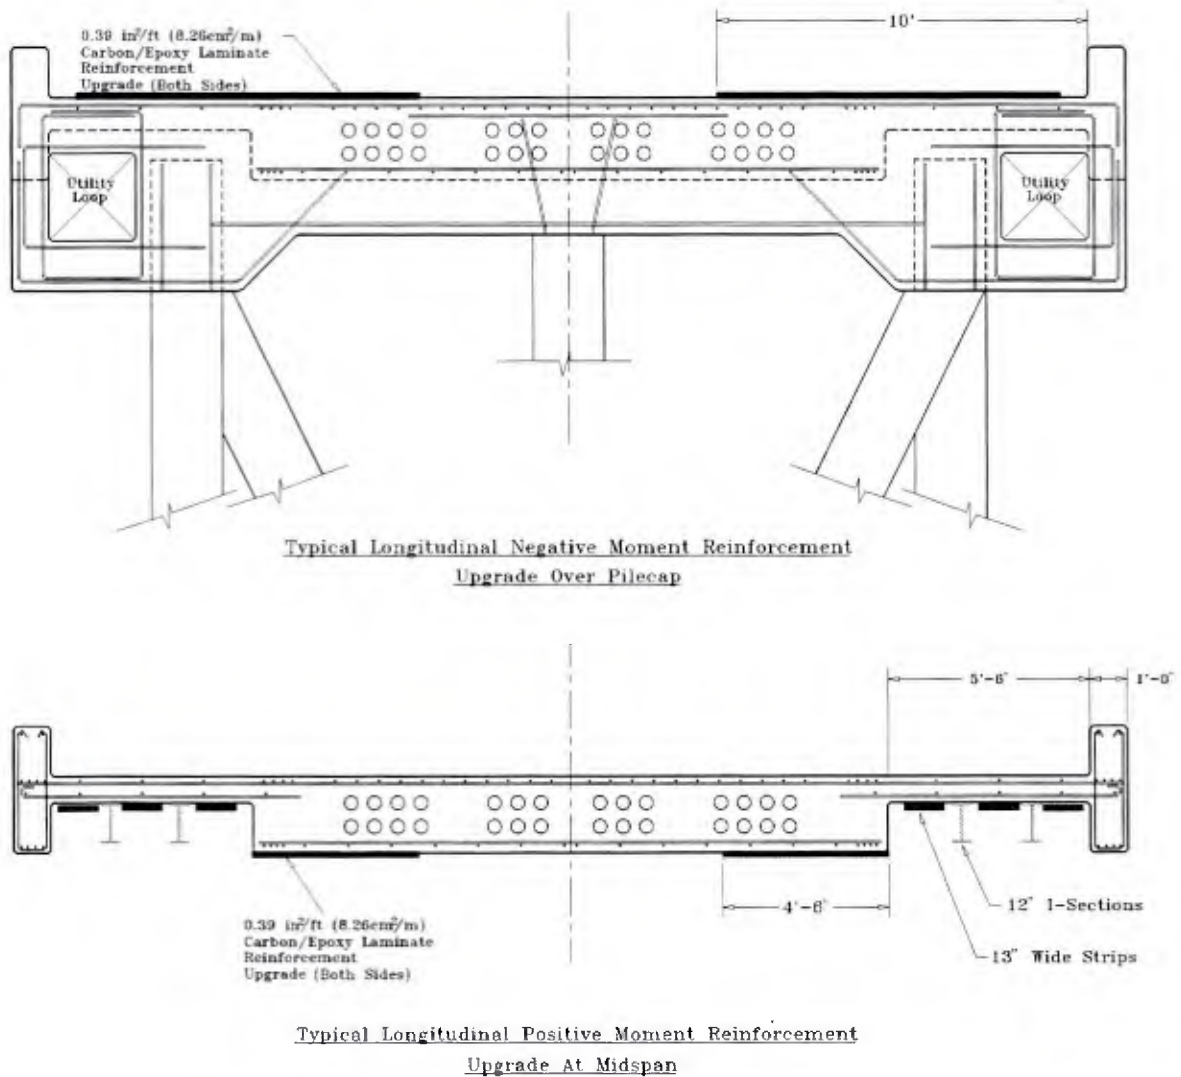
Typical post strengthened cross sections of carbon laminate and composite I-sections.
